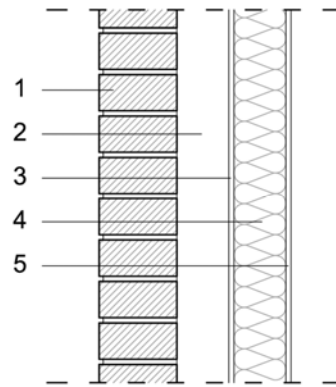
Composition of the studied façade, vertical section: (1) face brick; (2) ventilated air chamber; (3) waterproof panel; (4) insulation layer; (5) plasterboard
